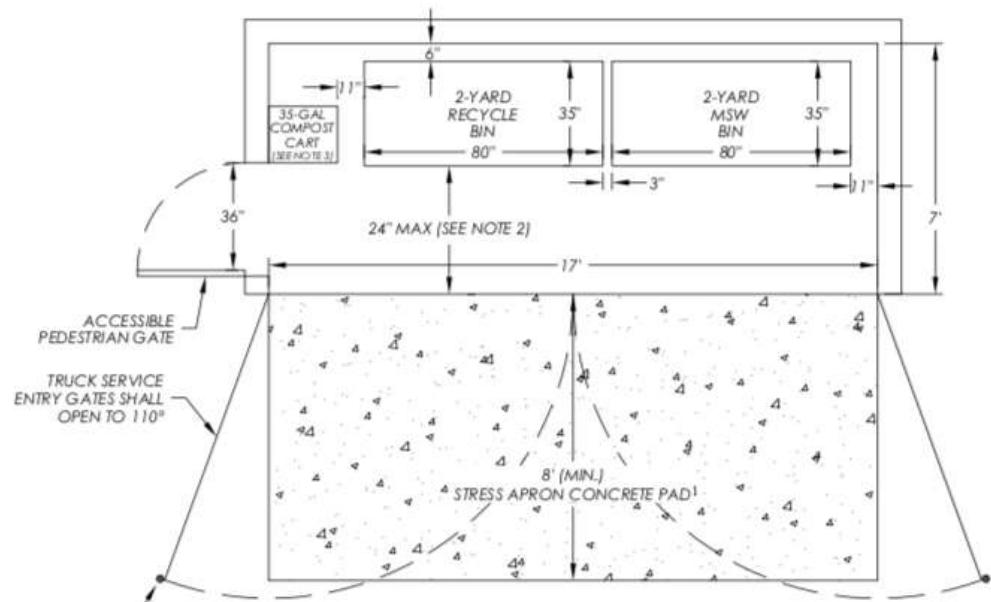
DETAIL PROVIDED TO SHOW GENERAL LAYOUT AND DIMENSIONS OF A CART ENCLOSURE. SEE DETAILS SWR-1 AND SWR-1.1 FOR ADDITIONAL ENCLOSURE INFORMATION AND NOTES.
